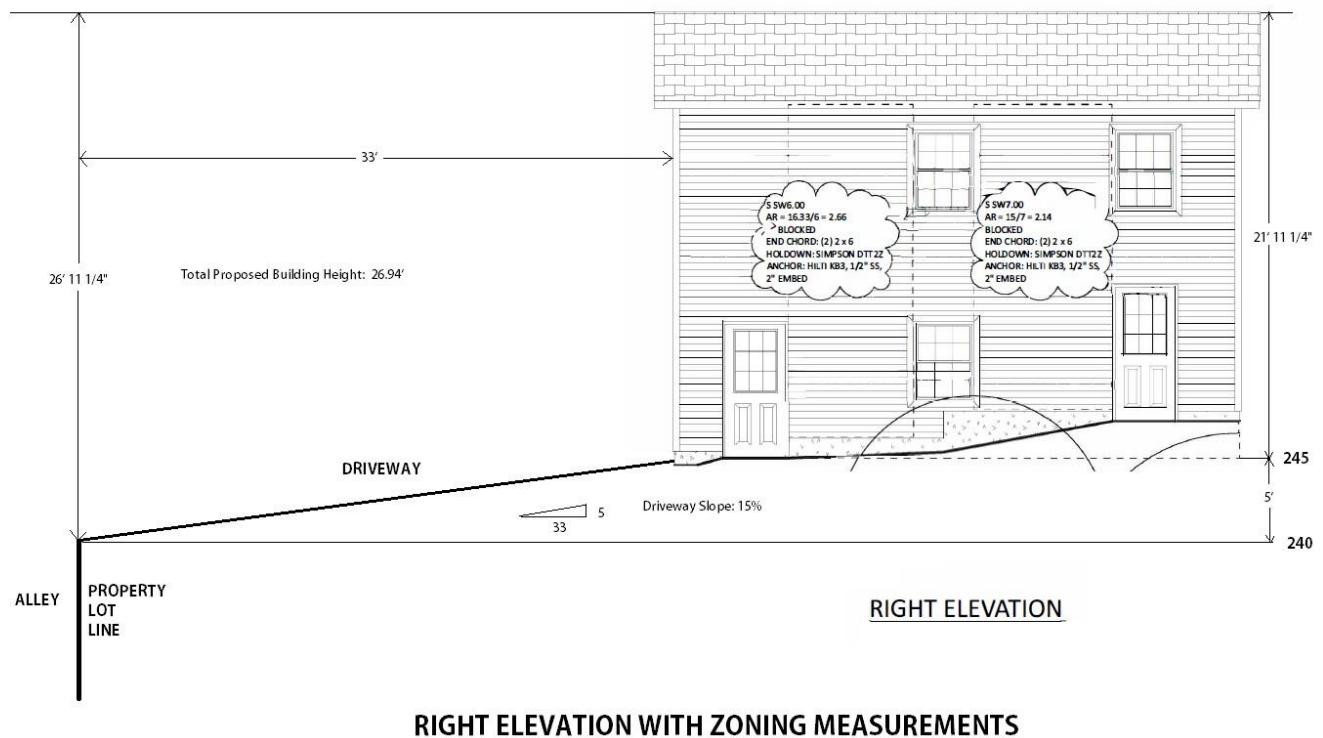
Right Elevation Drawing with Building Height and Slope Measurements
